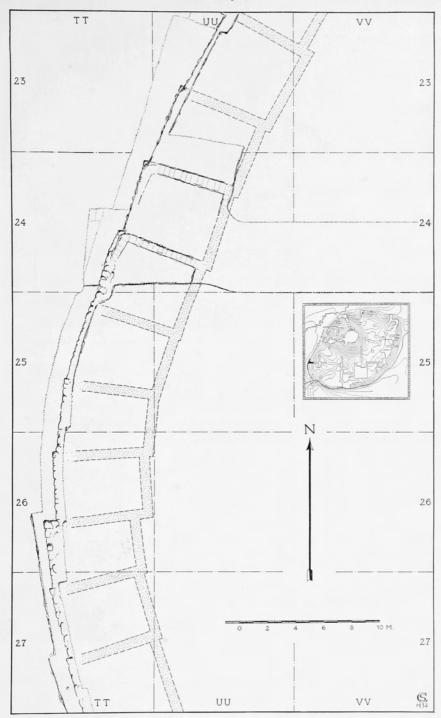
Plan of City Wall in UU 23-TT 27. Reconstructed Parts Stippled. Scale, 1:200
